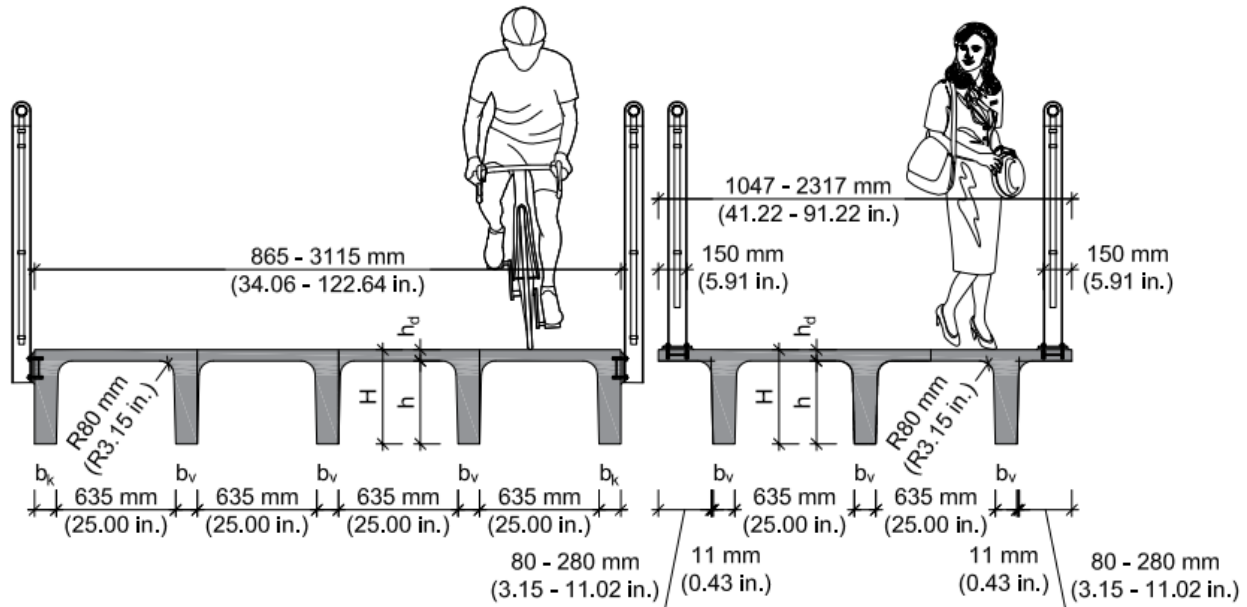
Typical cross-section of the short span footbridge system and the possible variants and basic dimensions
